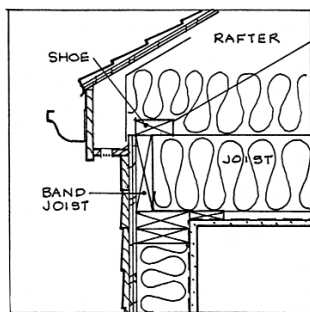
When using joists, put a band joist around the attic floor and add a shoe on top of the joists to receive the rafters. This allows room for a full depth of insulation.
